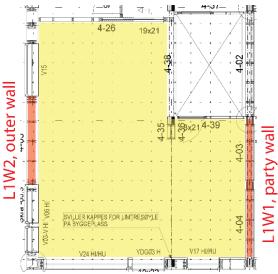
Floor plan of the apartment used for the measurements at location 1. The investigated walls L1W1 and L1W2 are highlighted.
